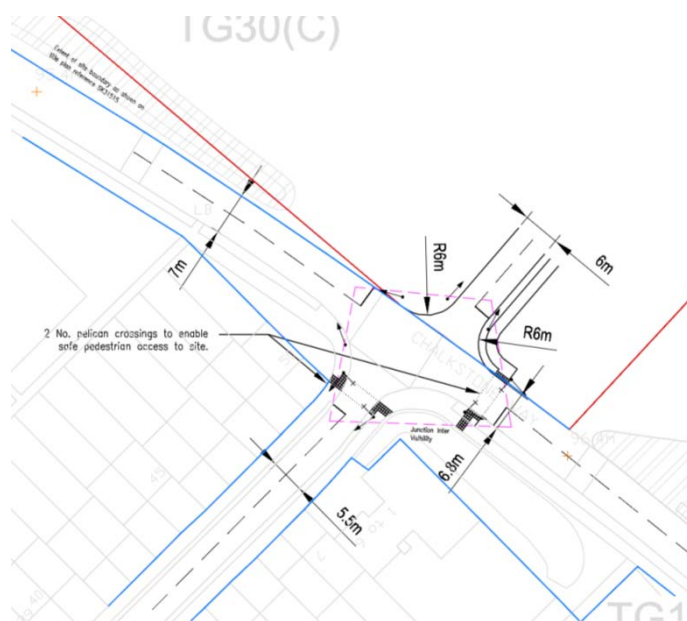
Potential access onto Chalkstone Way – signalled layout
